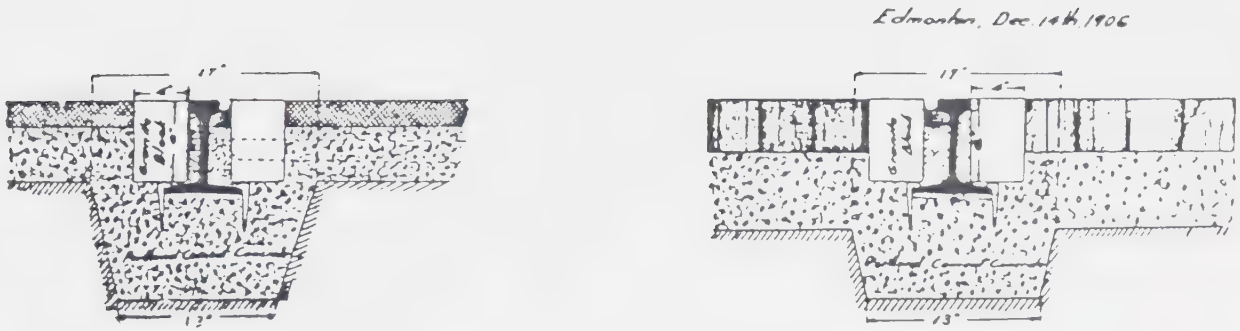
CROSS-SECTIONS OF PROPOSED TRACK CONSTRUCTION, 1906
